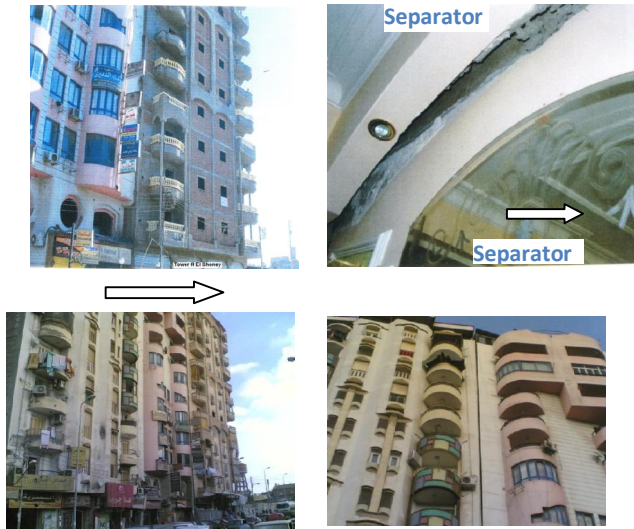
Emerging gaps between the oblique building and buildings adjacent[23,author].
